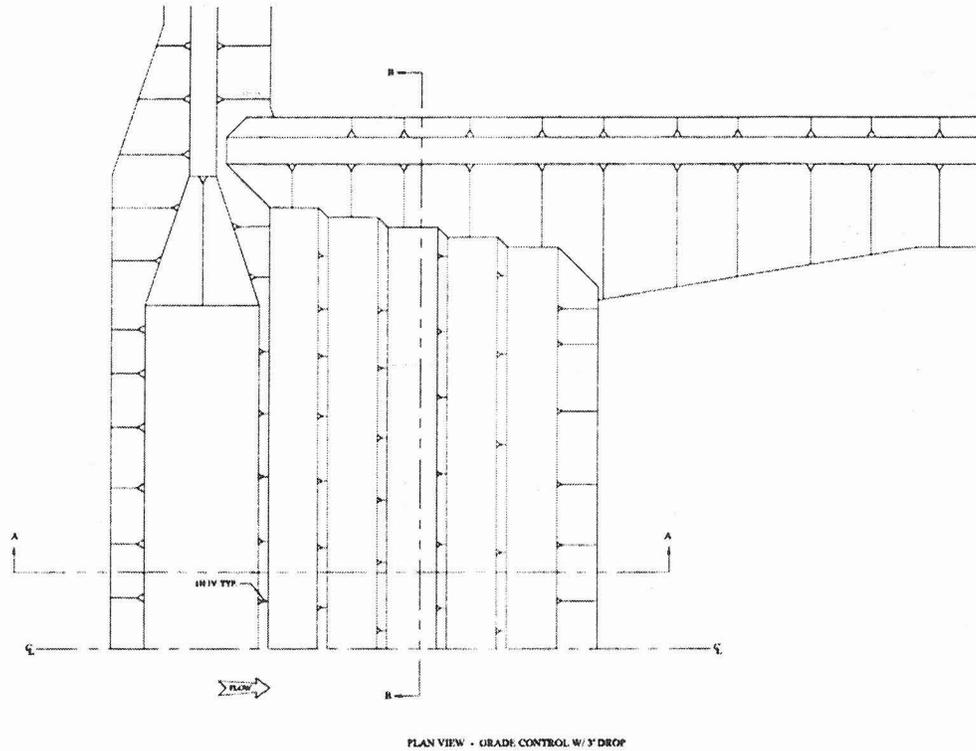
Typical plan view of grade control with 3 foot drop. Centerline of channel is at bottom of figure.
